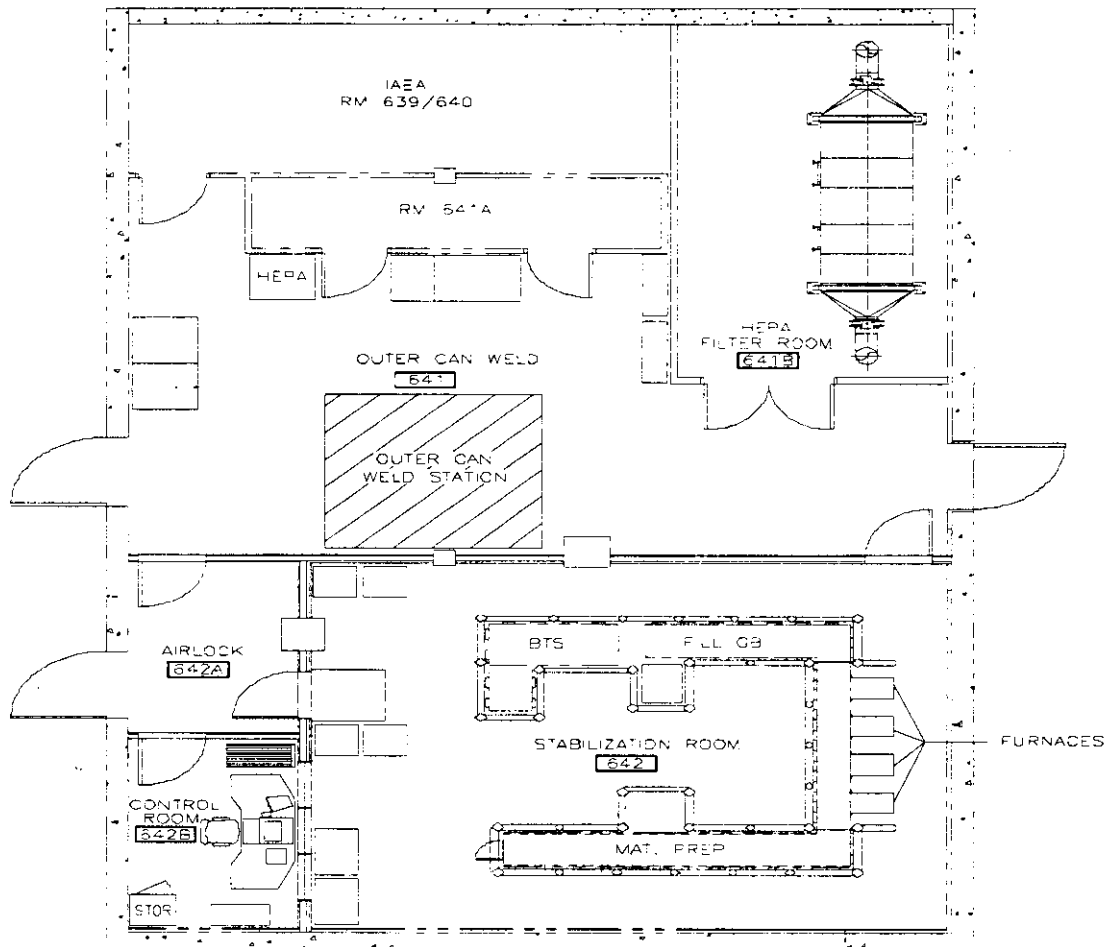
2736-ZB Building, Rooms 641/642 Layout.
